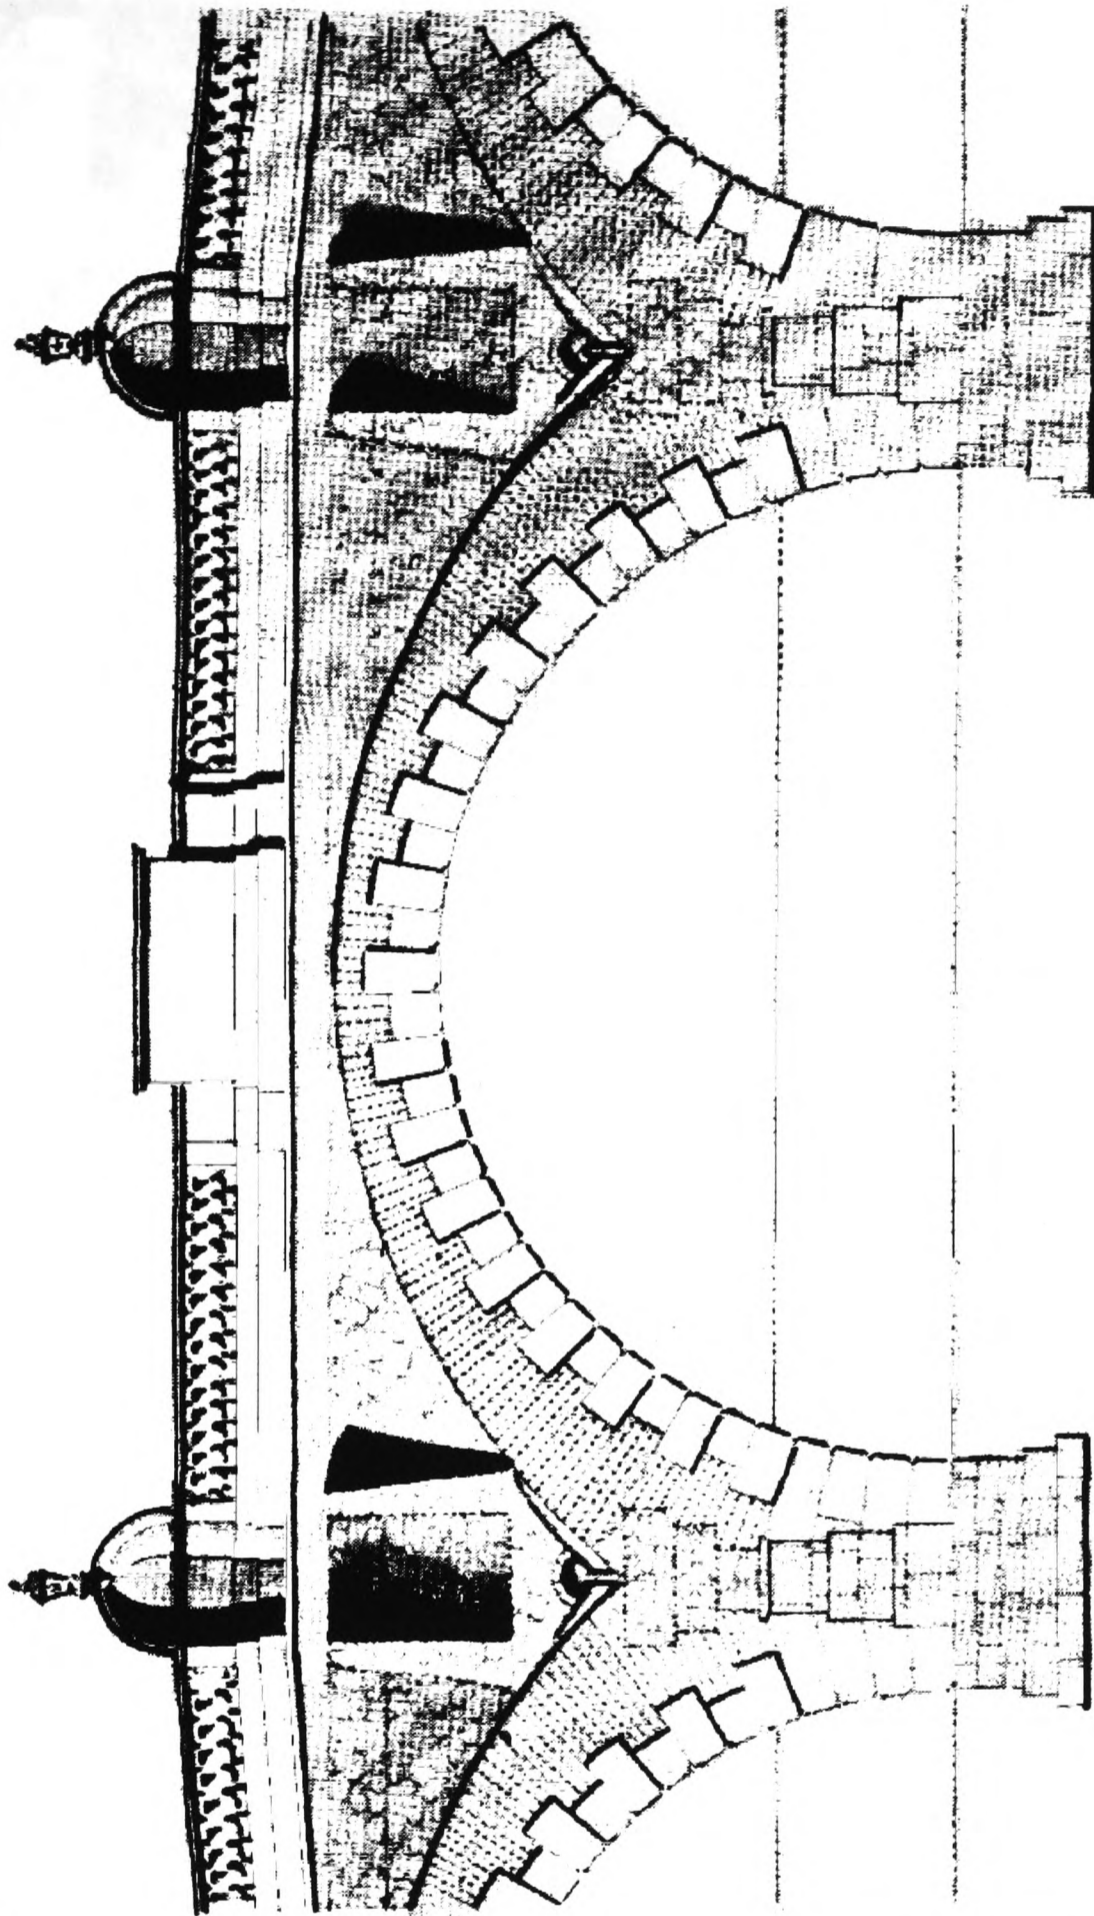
Section of Labelye's final design for Westminster Bridge (after Walker, 1979)
